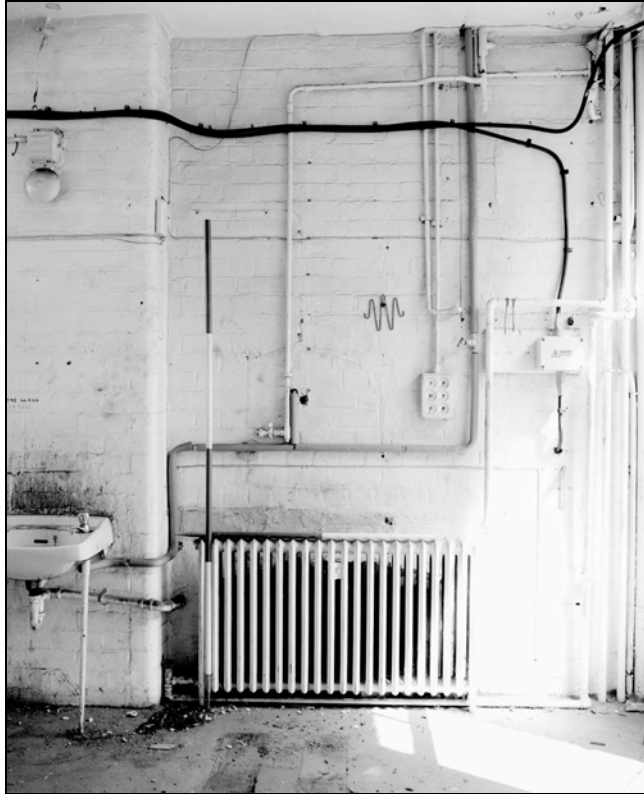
Building 3; first floor, blocking in south-east corner in A21 (Film 4.10)
